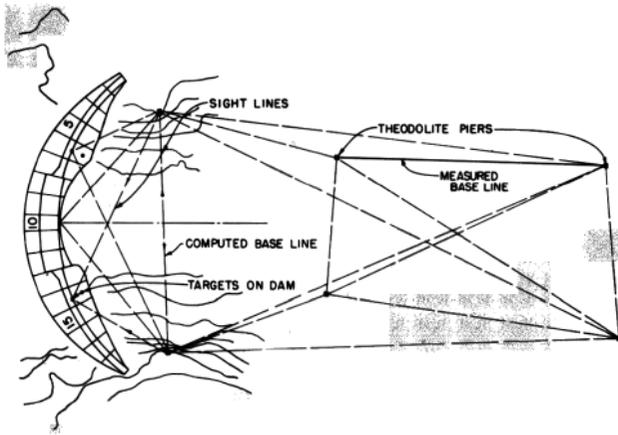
A triangulation system layout for an arch dam.—288-D-3099
